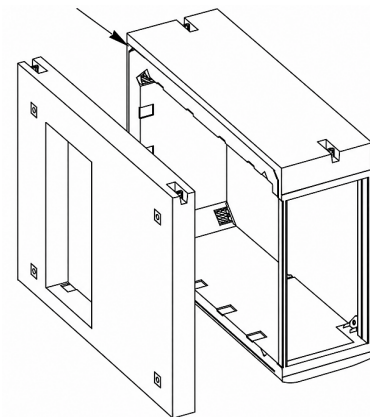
Structural diagram of a reinforced concrete block of tubular rectangular shape with a doorway LSHSS-2
